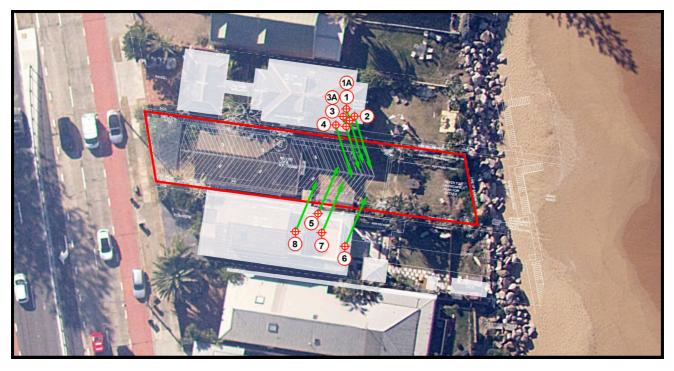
Selected neighbouring property viewpoint locations from Nos.1160 and 1164, Pittwater Road, for visual impact assessments, shown in plan and elevation.
